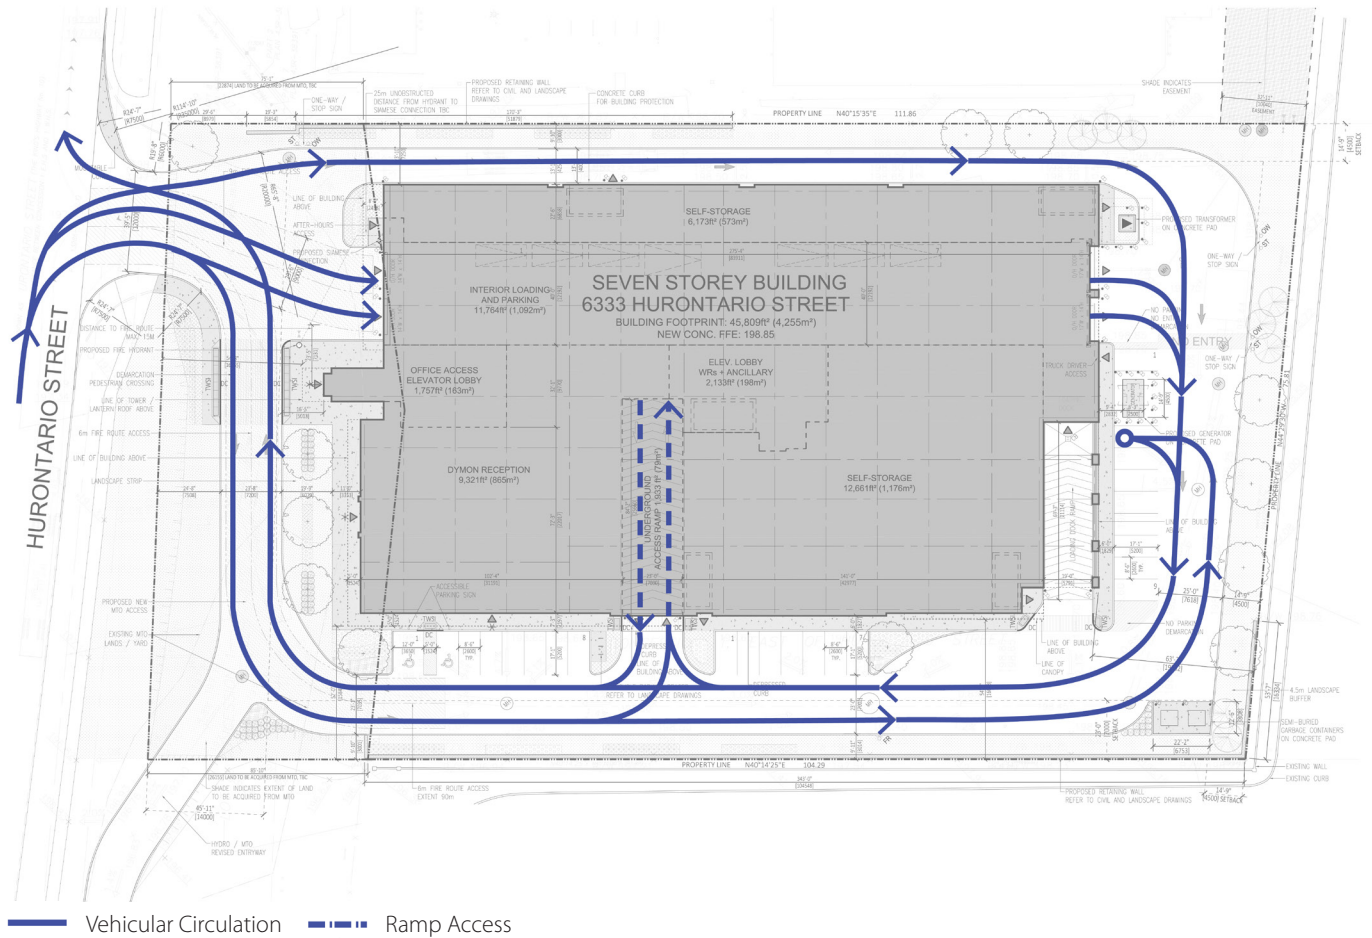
Ground floor parking plan and vehicular circulation. Base plan by Nicolas Caragianis Architect.
